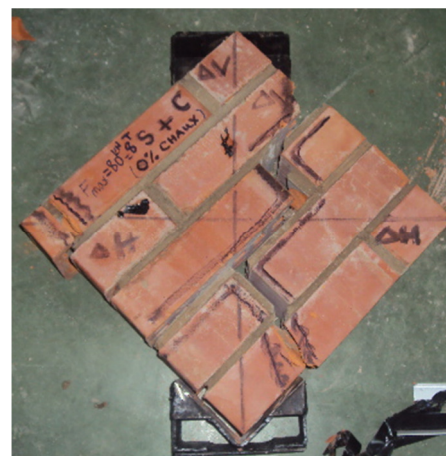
Shear sliding failure in horizontal and vertical joint mortar for masonry wallets.
